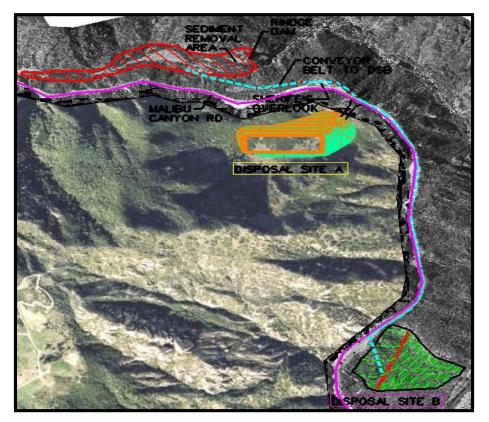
Conveyor Belt Alignment to Disposal Site B
